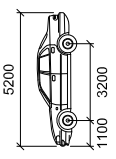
Passenger Vehicle, Entering the Underground Parking Garage
